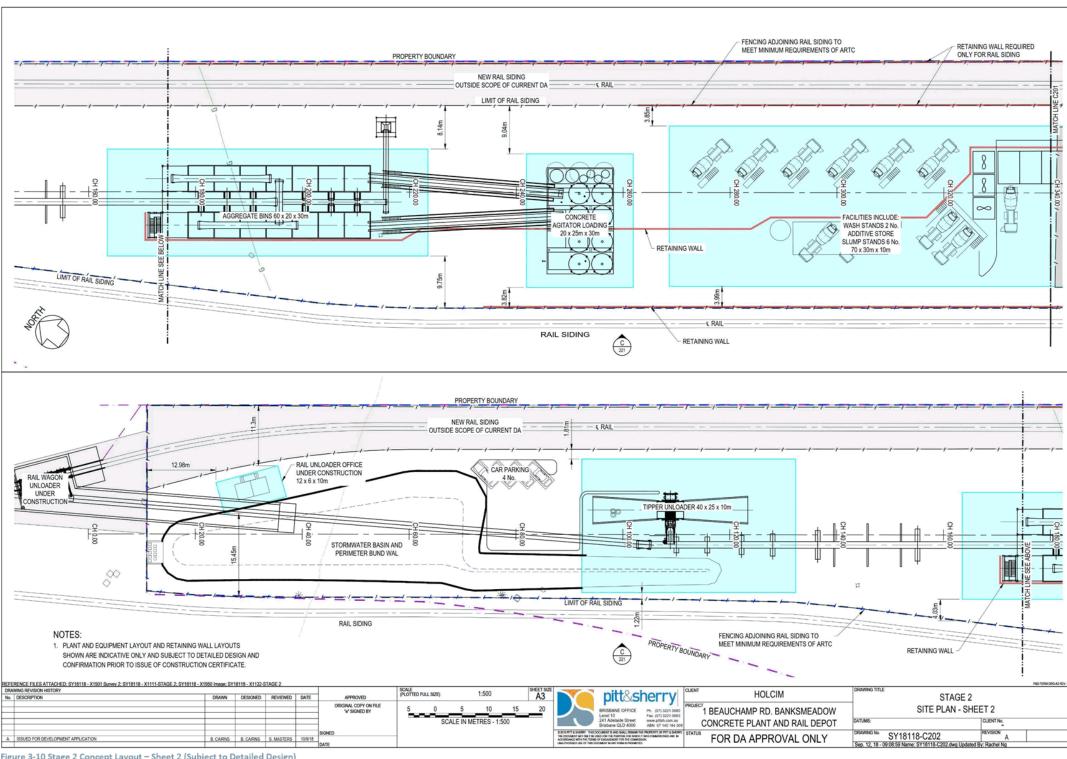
Stage 2 Concept Layout – Sheet 2 (Subject to Detailed Design)
